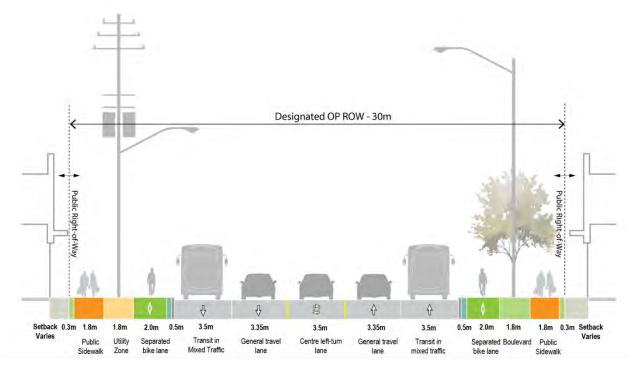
Preferred ROW Alternative (Segment 6)
